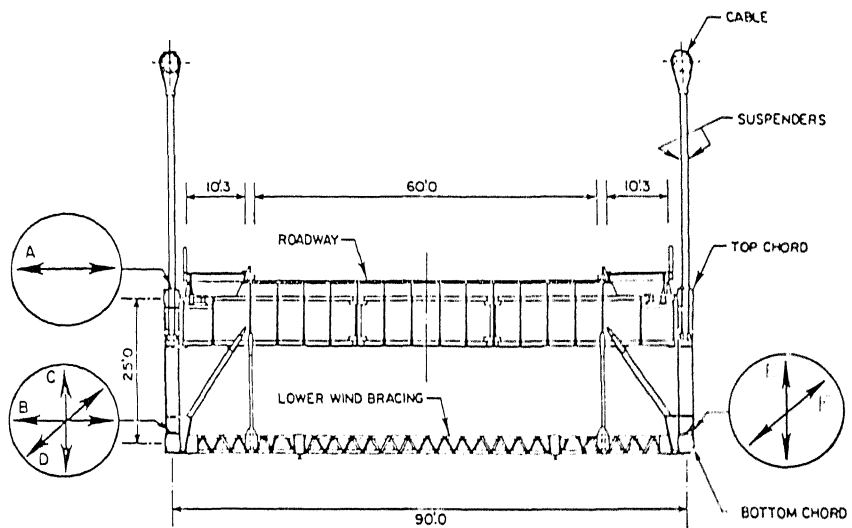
TYPICAL SPAN CROSS-SECTION SHOWING SENSOR PLACEMENT
